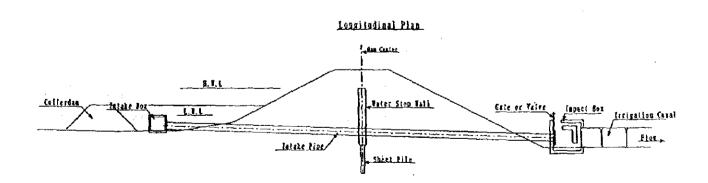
Installation Plan of Intake to the Existing None Intake Type Small Reservoir
